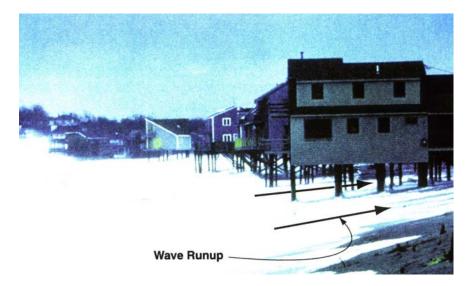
Erosion due to wave runup under elevated buildings in Scituate, Massachusetts (Photograph by Jim O'Connell).
